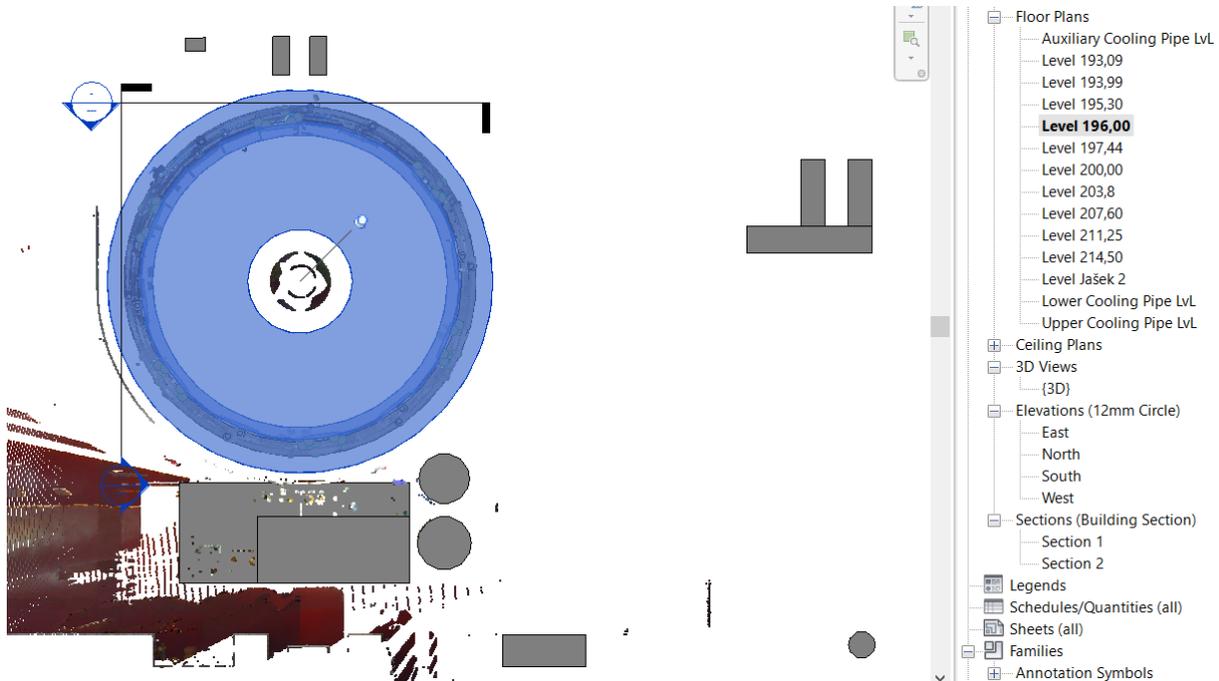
Elevation 196,00 floor plan showing the stator frame positioned at the center of Unit 1.
